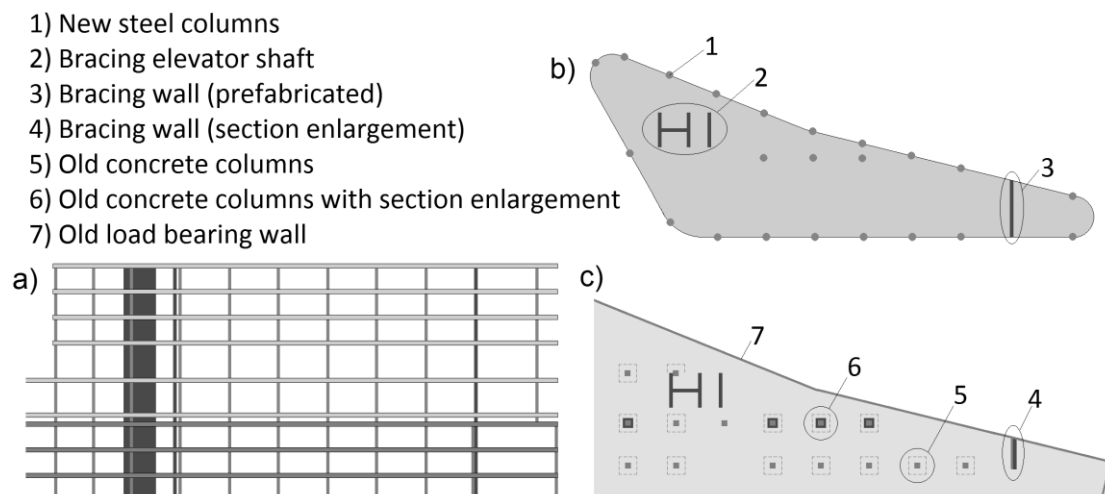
Structural system of Bonnier's Art Gallery, a) section, b) plan of new part and c) plan of old part.
